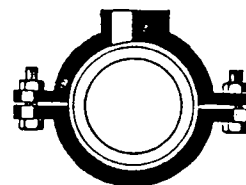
Tapping bridge for PVC and asbestos cement pipes
